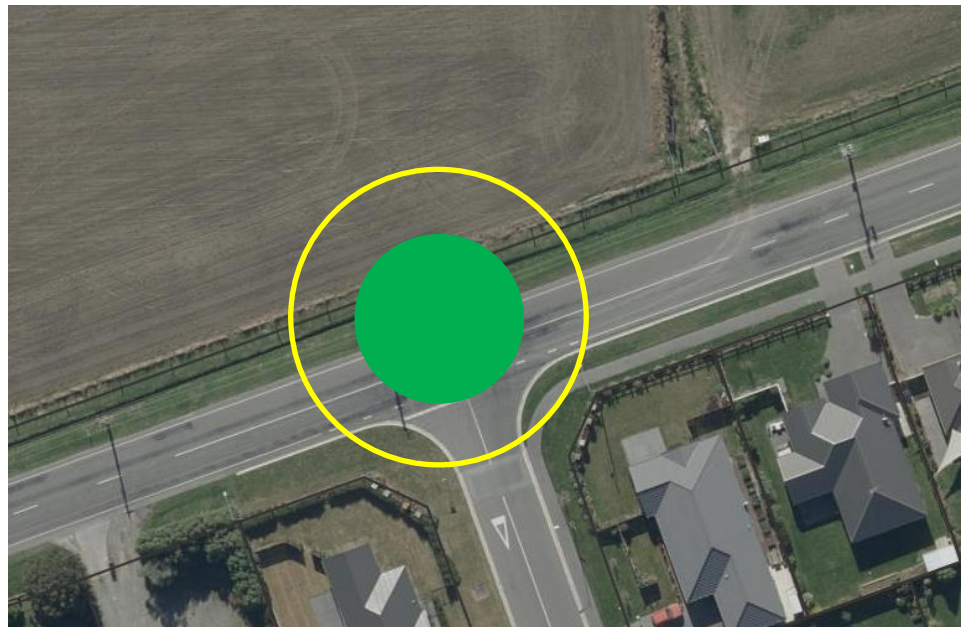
Key Geometry of Potential Roundabout at High Street / Clausen Avenue / Site Access Intersection
